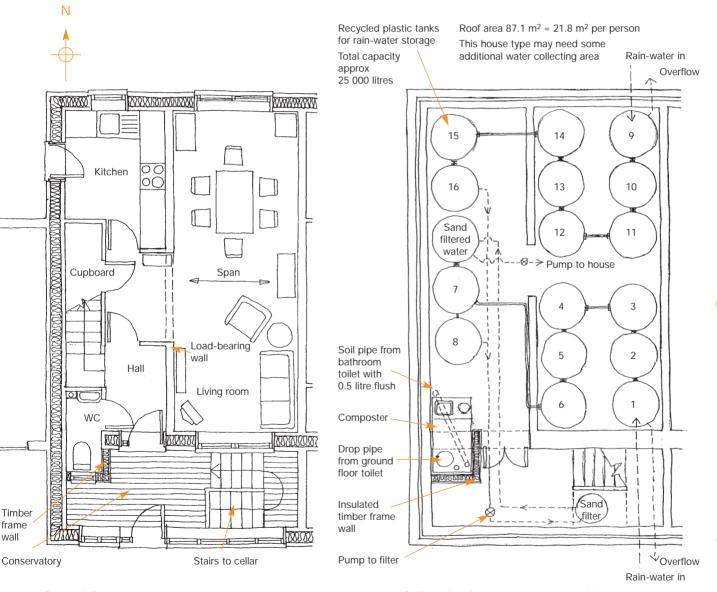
Floor plans for a typical autonomous house based on BRECSU standard house type
